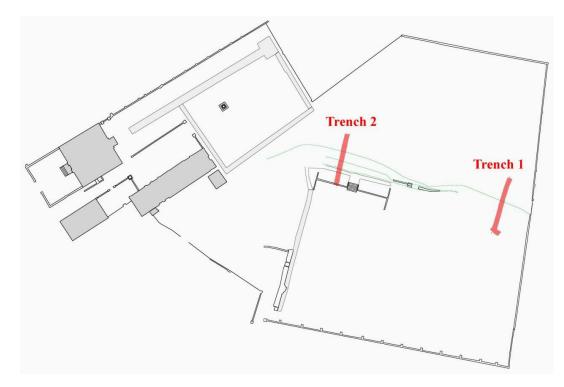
Trench location plan, based on an original survey drawing by Butler+Hegarty Architects (Drawing No: 0910506/SK300-3).
